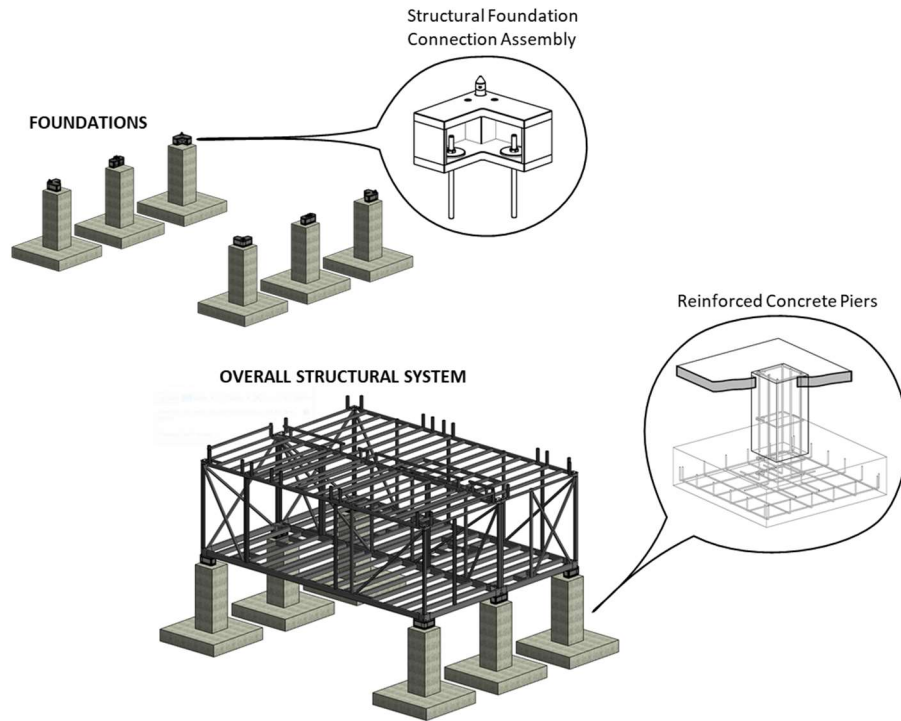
Connection of Cast-in-Place Concrete Foundation to Structural System
